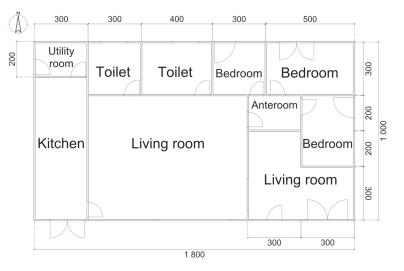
Plan views of the benchmark single detached house (dimensions in cm).
